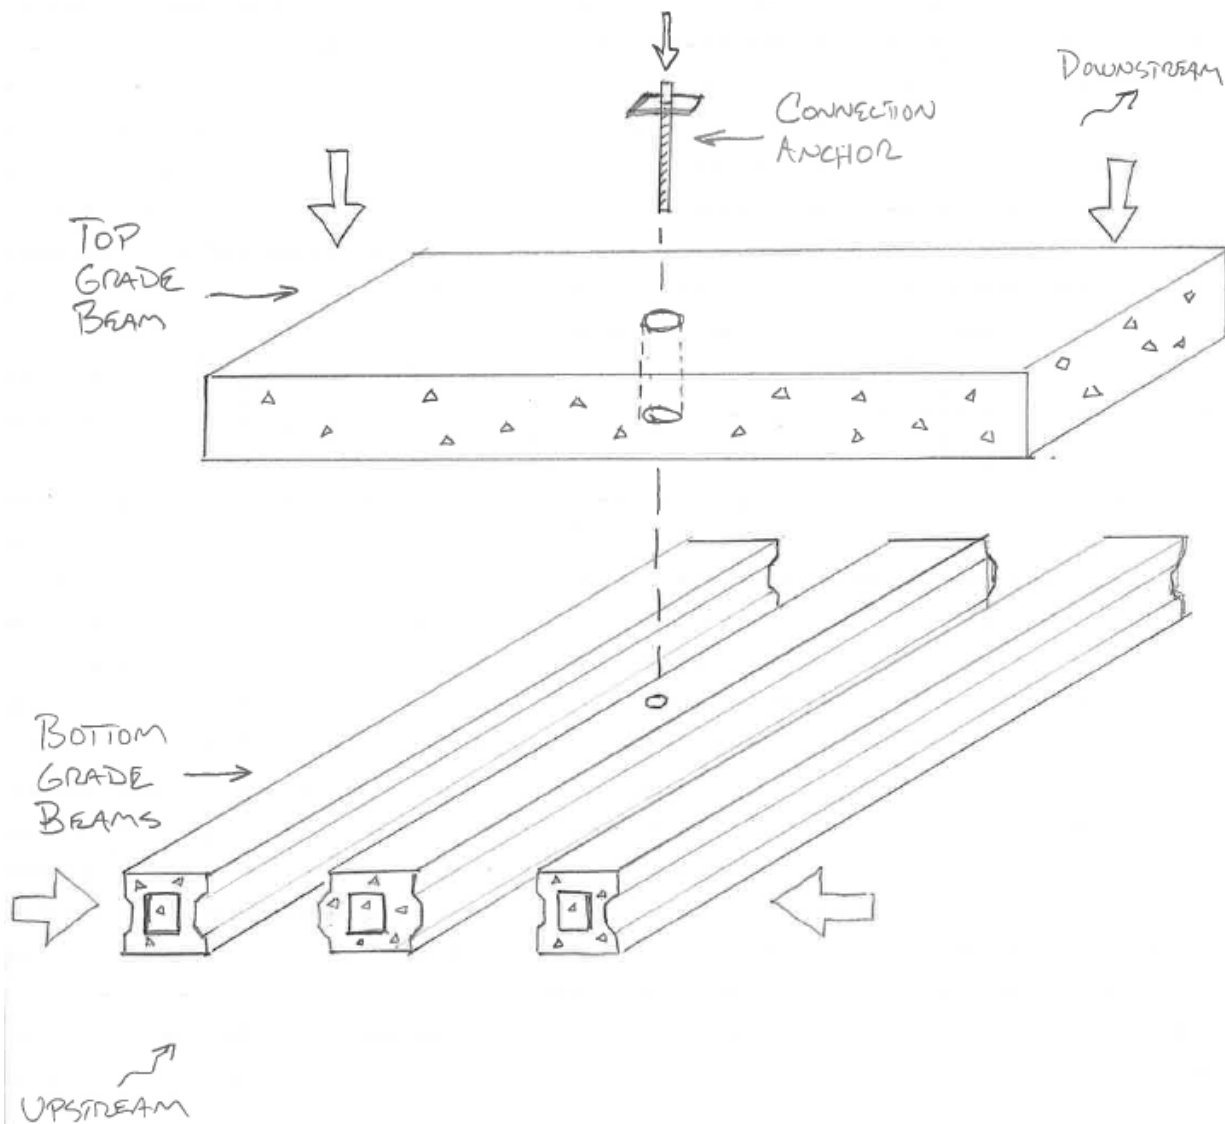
Concept sketch of the two-way, two-layer precast concrete grade beam foundation system.
